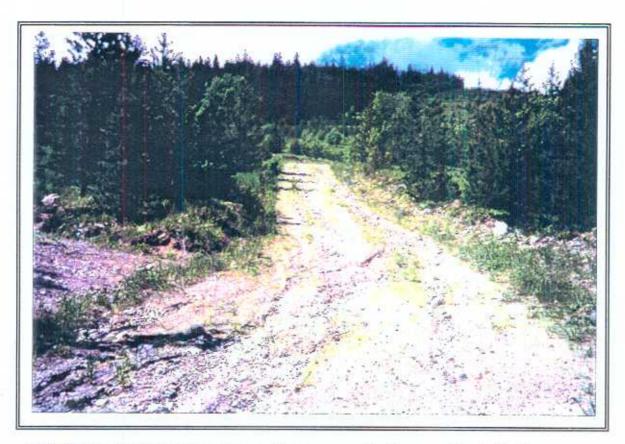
Road surface erosion on the access road to the powerline in the Camp Creek sub-basin. (June 1996 - ID# 4-13)
